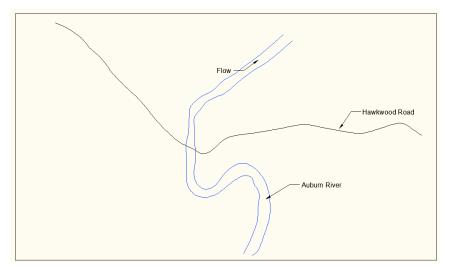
Plan view of the existing alignment of Flagstone Bridge
